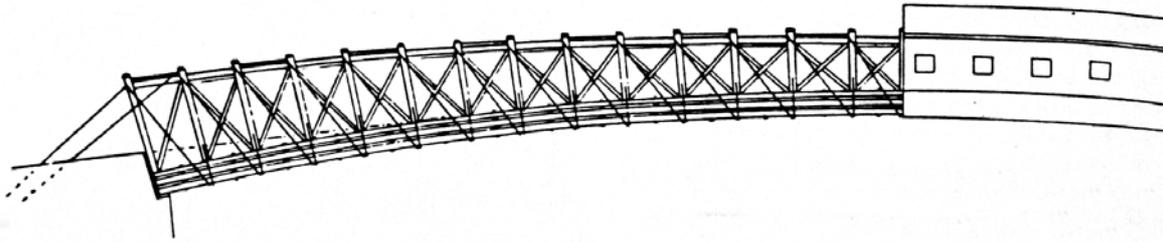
The "Colossus," an arched through-truss with a single span of 103.6 m (340 ft) built at Philadelphia, Wernwag, 1813. (James²)
